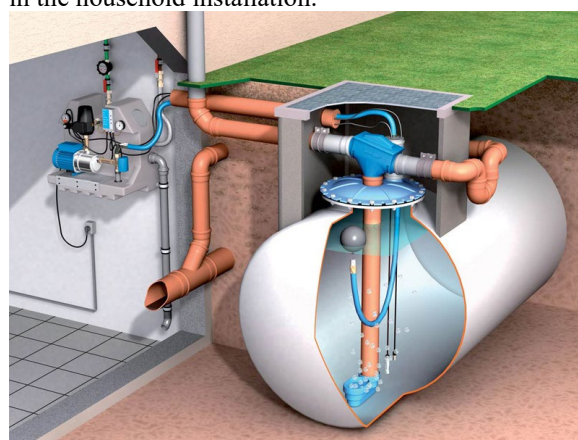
Complex rainwater collection system with pump to ensure pressure in the domestic installation and connection to the public sewer.
